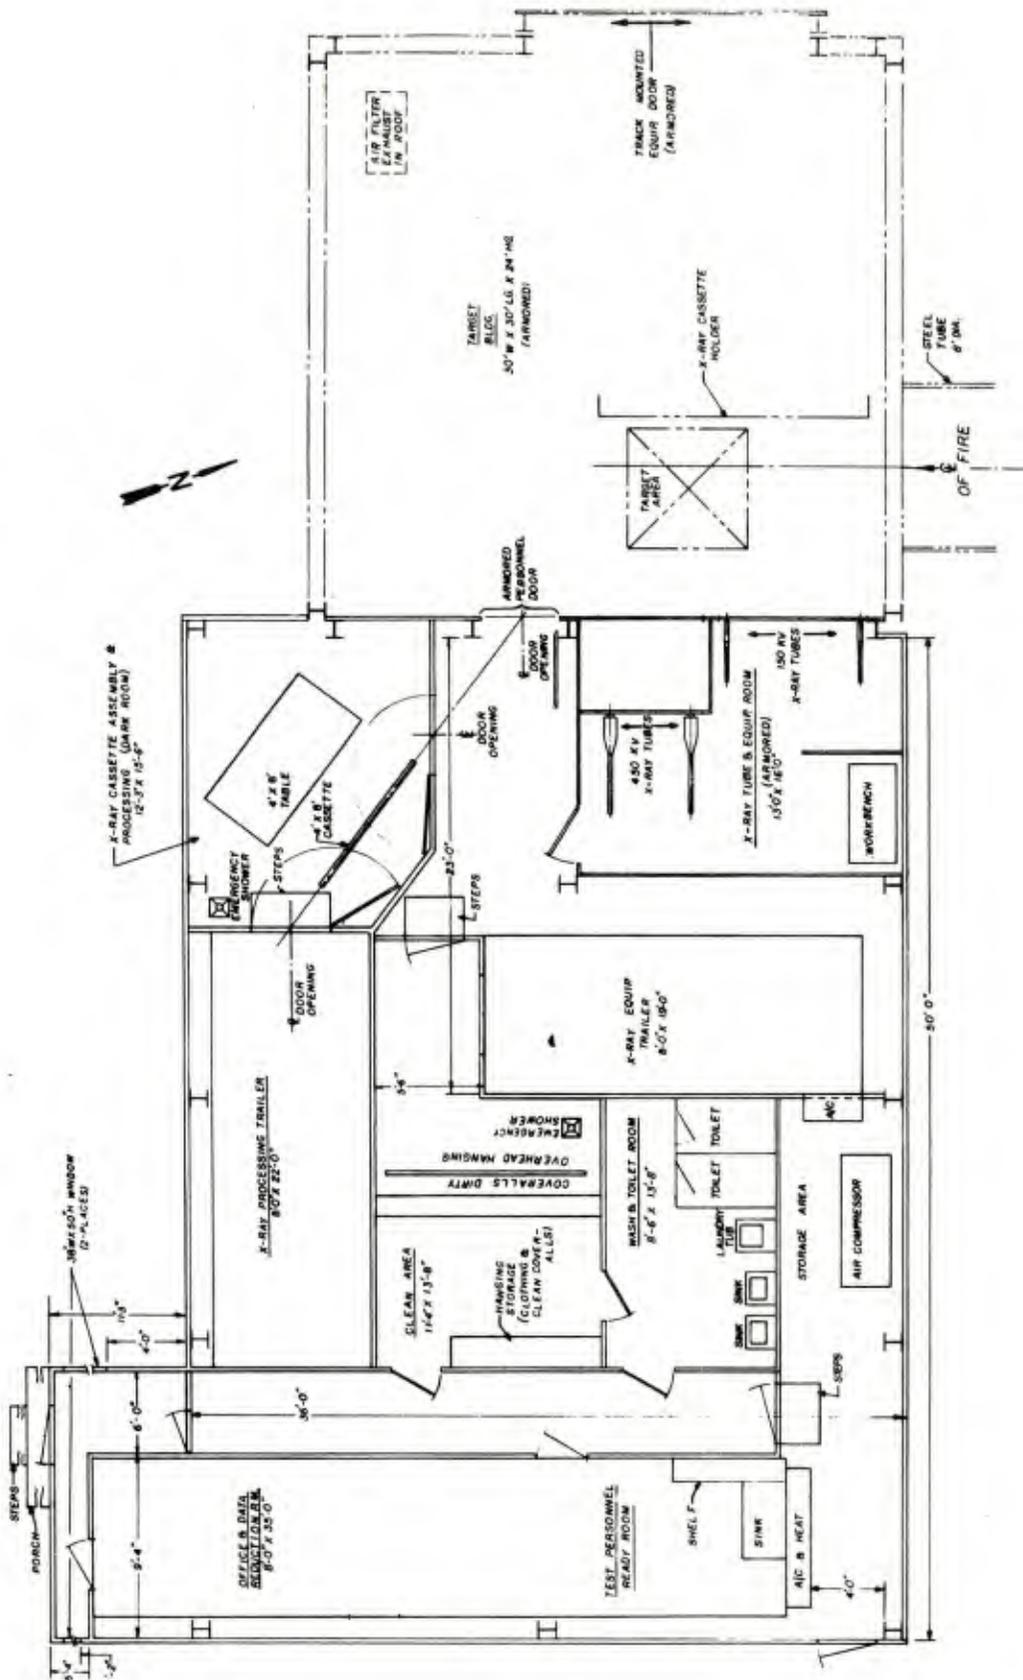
Range 14 (R14) Floor Plan of Target Bay and Support Equipment Enclosures
